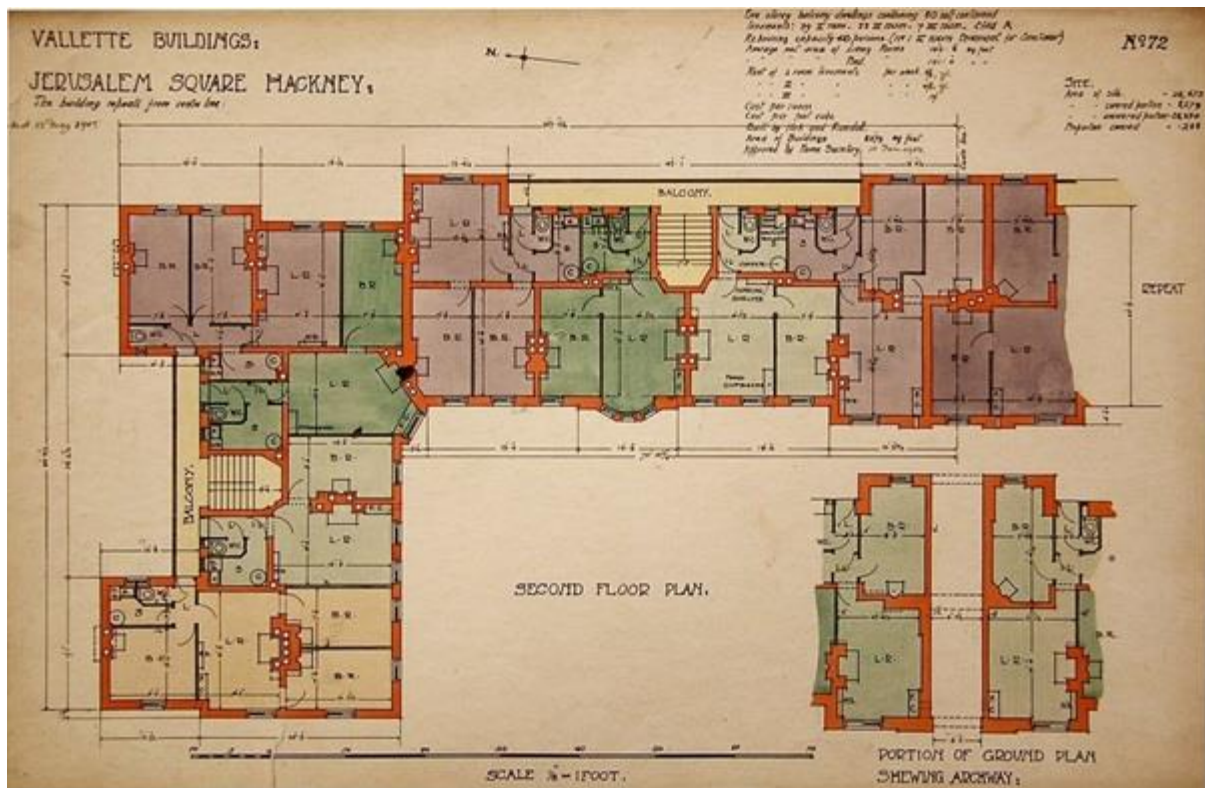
Valette Buildings floor plan (LMA ref: LCC/AR/HS/03/057)
